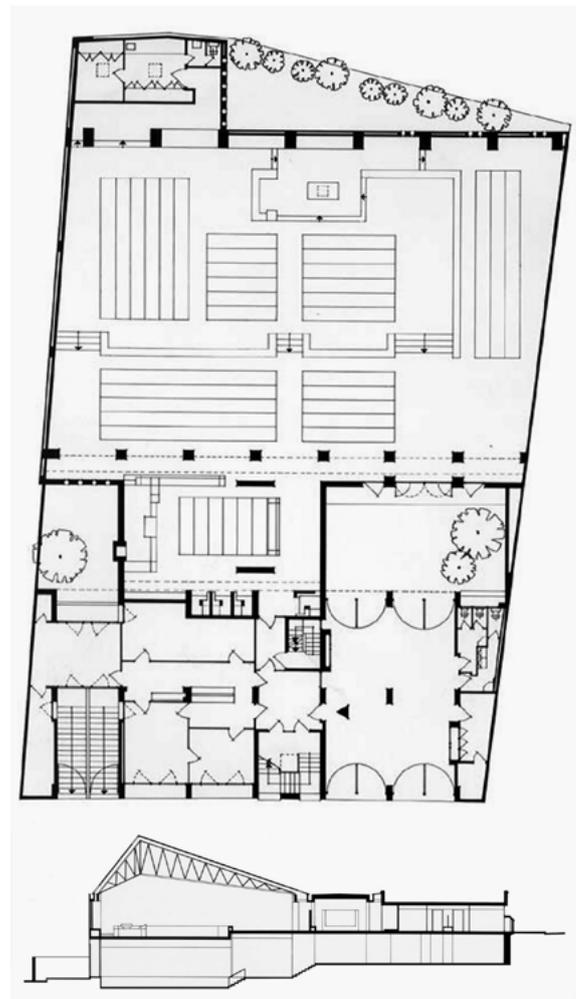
Floor and section of the parish church of Sant Sebastià. Drawings courtesy of MBM architects.
